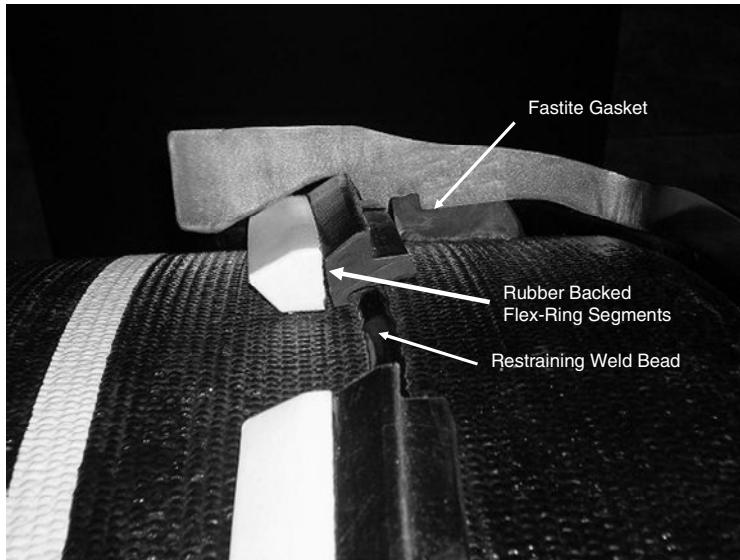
AMERICAN Flex-Ring® Joint Ductile Iron Pipe
